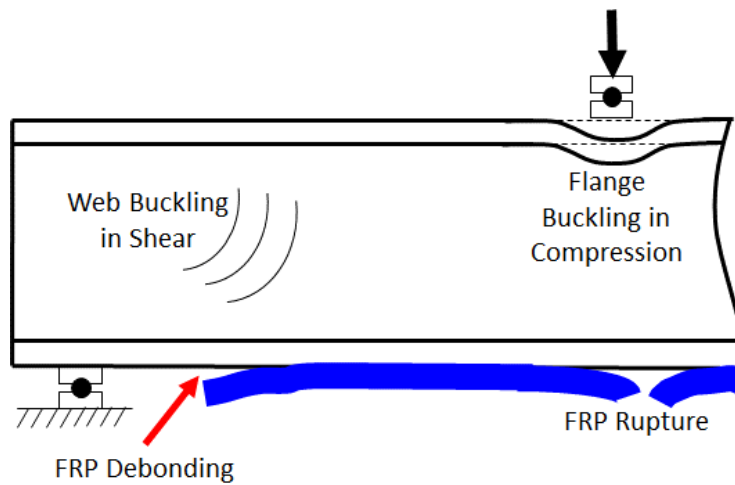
Most common failure modes for steel beams strengthened with FRP [53].
